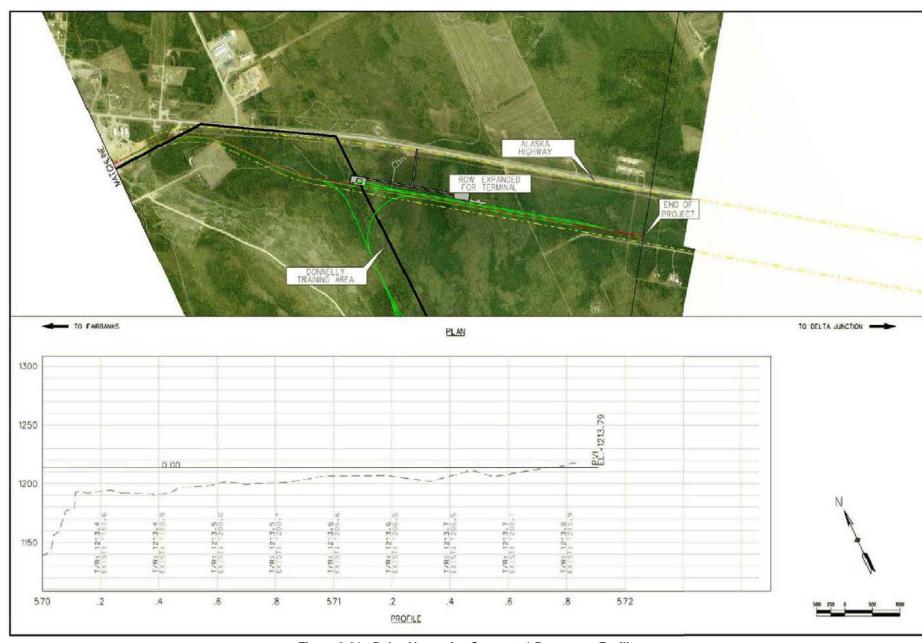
Delta Alternative Segment 1 Passenger Facility
